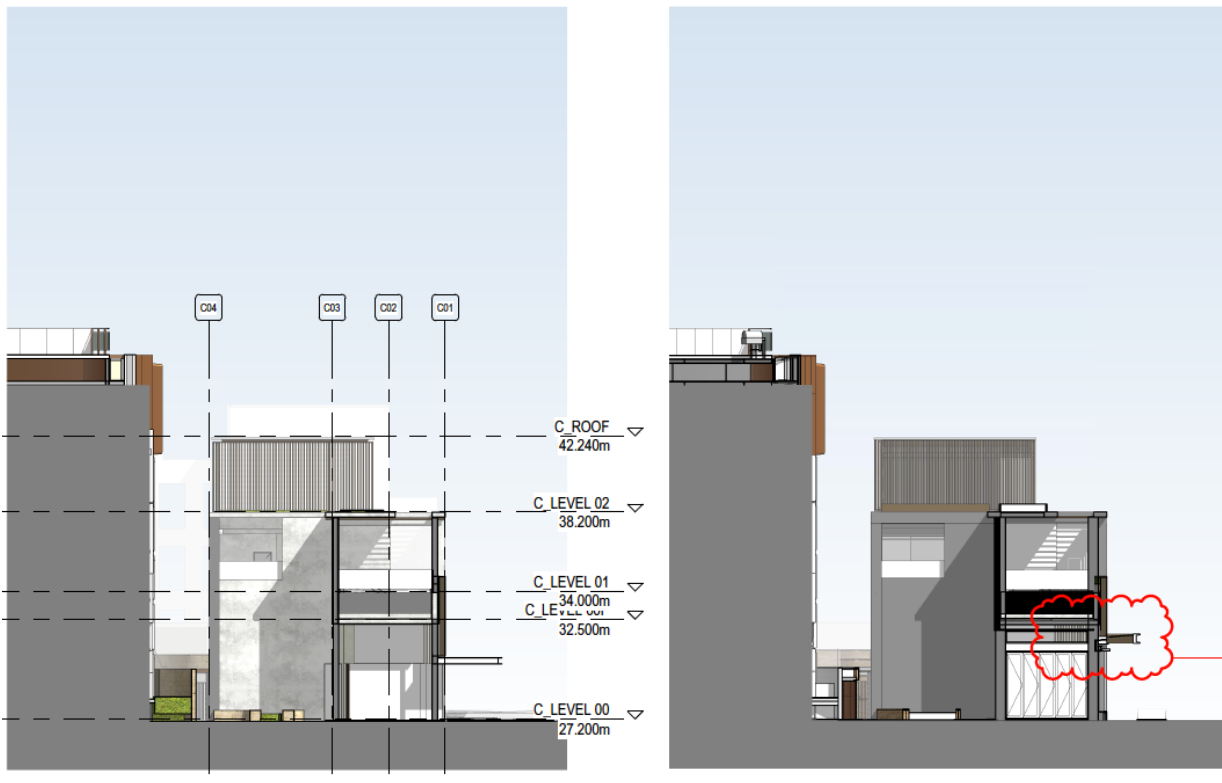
North Elevation Approved (RHS) and Proposed (LHS)
